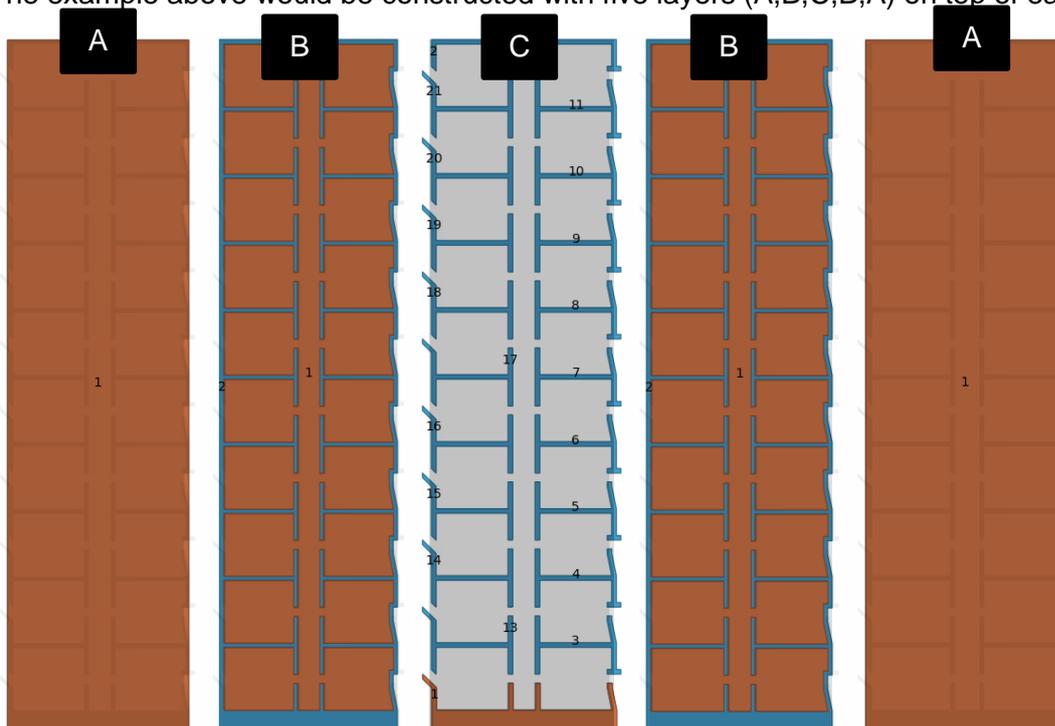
façade profiles A) Bottom and top Rectangular closed façade profile B) closed façade with patterns C) open façade with aerodynamic elements
